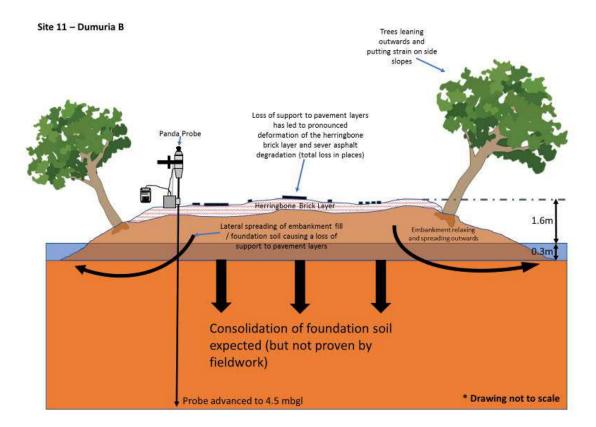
Site 11 Dumuria B Observational Ground Model
